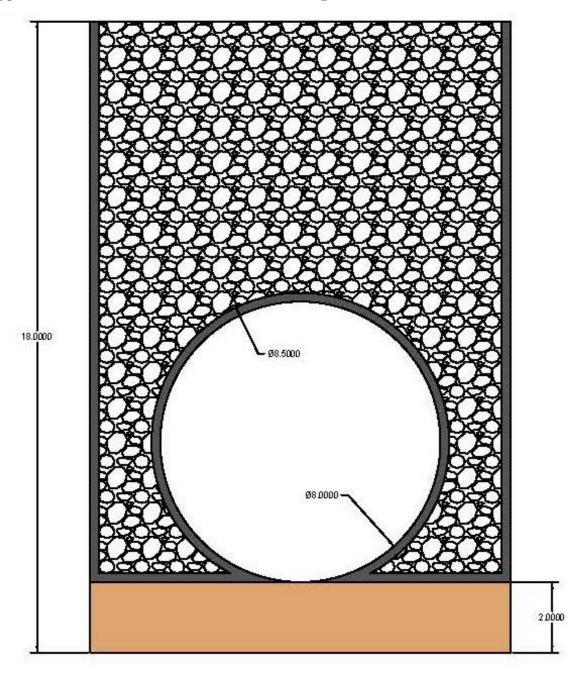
AutoCAD drawing of the cross-section of the French Drain (dimensions in inches)
